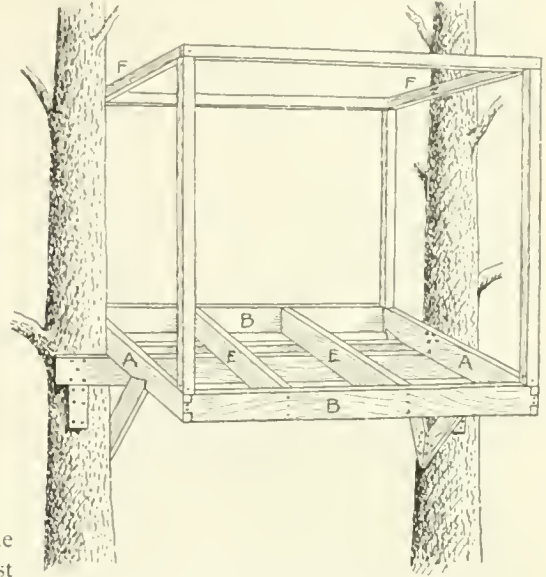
DETAILS OF FRAMING OF A TWIN-TREE HOUSE.
